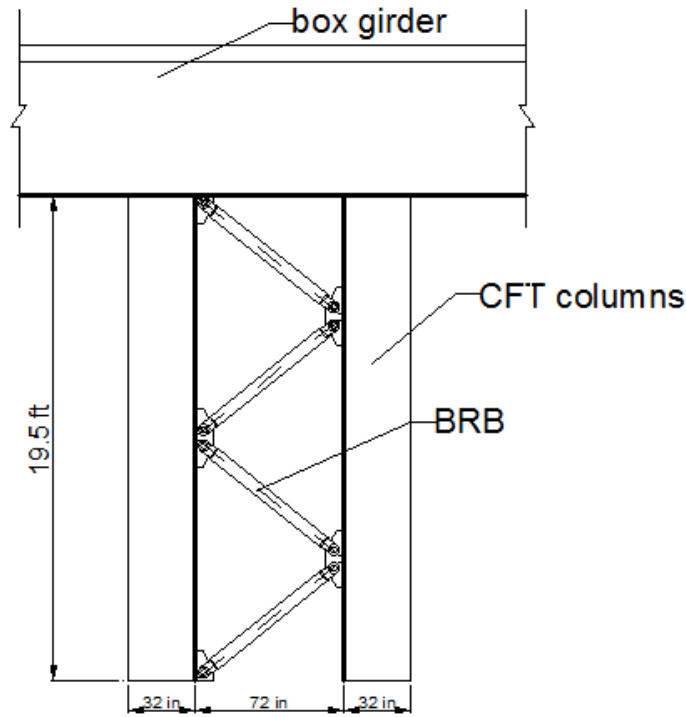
Longitudinal bridge bent with inserted BRBs
